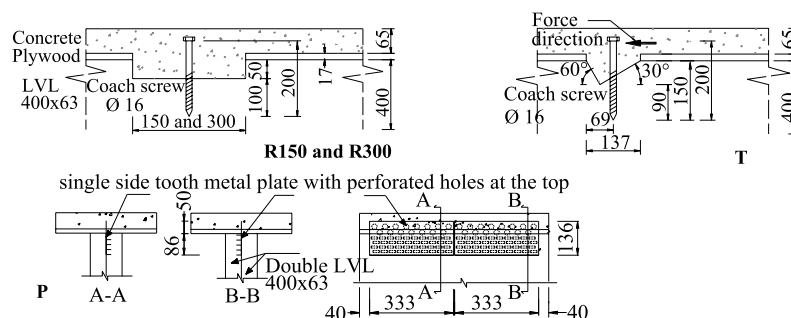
Four types of connectors used to construct the composite beam specimens (dimension in mm) [7].
